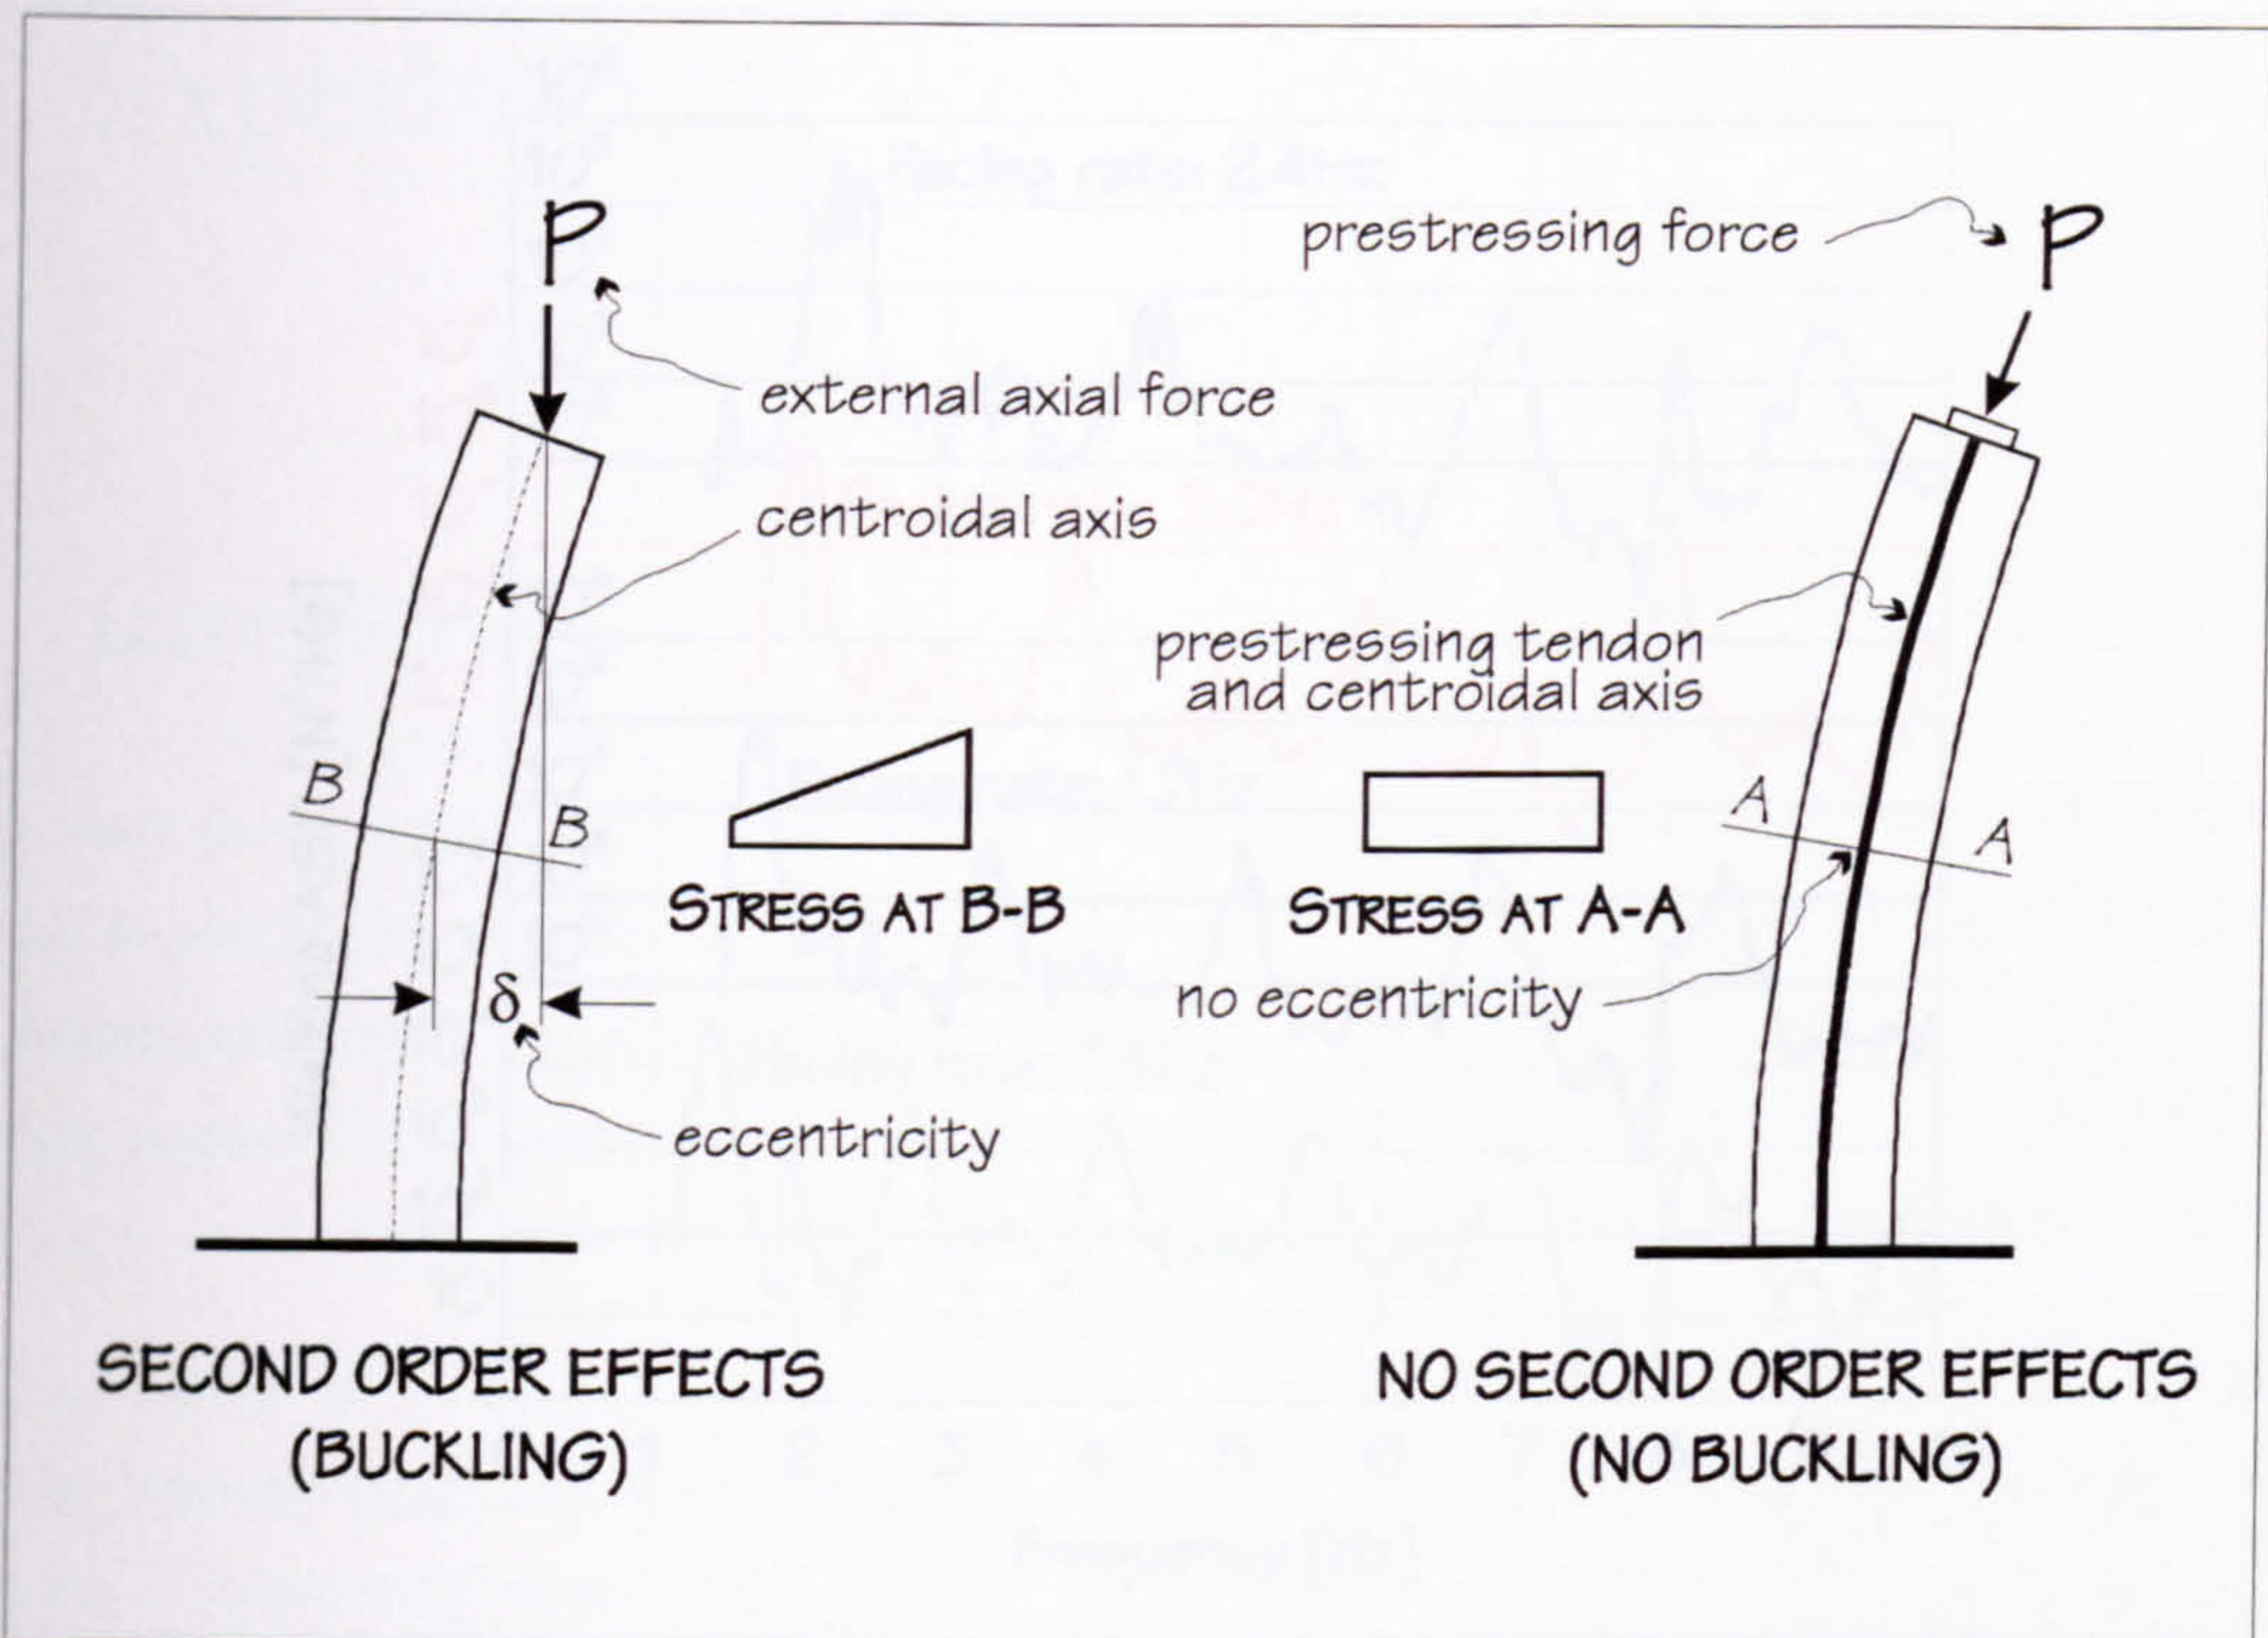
Axially loaded and internally prestressed concrete element (after Hurst, 1988).
